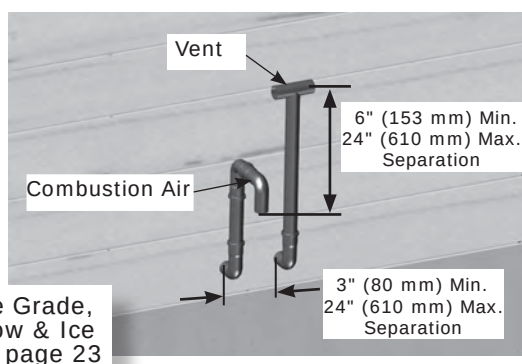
(2" / 60 mm ONLY) Twin Pipe Side Wall Vent CAN BE USED ON ALL SIZES
